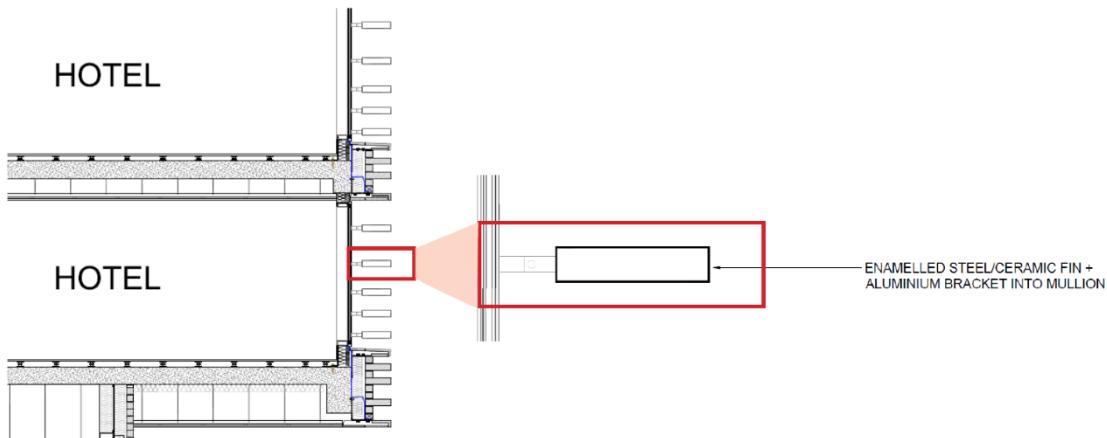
Proposed hotel façade section with enamelled fin zoomed in.
